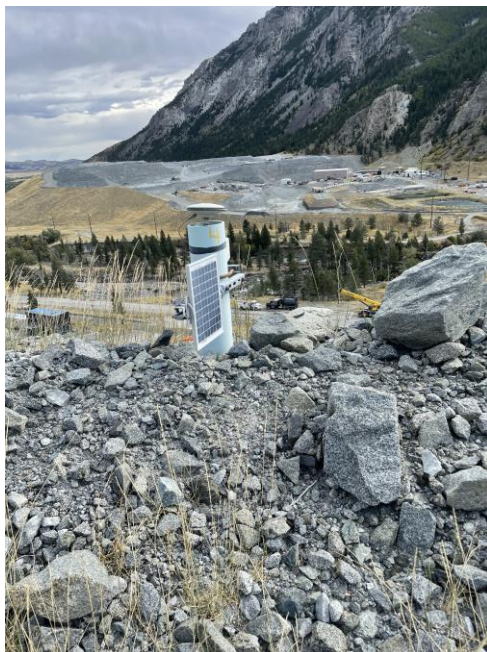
Southwest Embankment corner and West Diversion (Sept. 2022).
